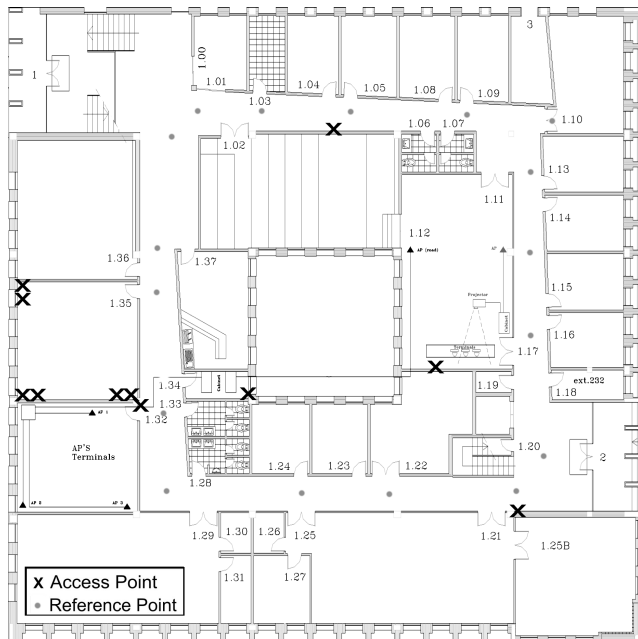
Floor plan of the test building with eleven Access Points (black crosses) and 17 reference points (grey dots)
